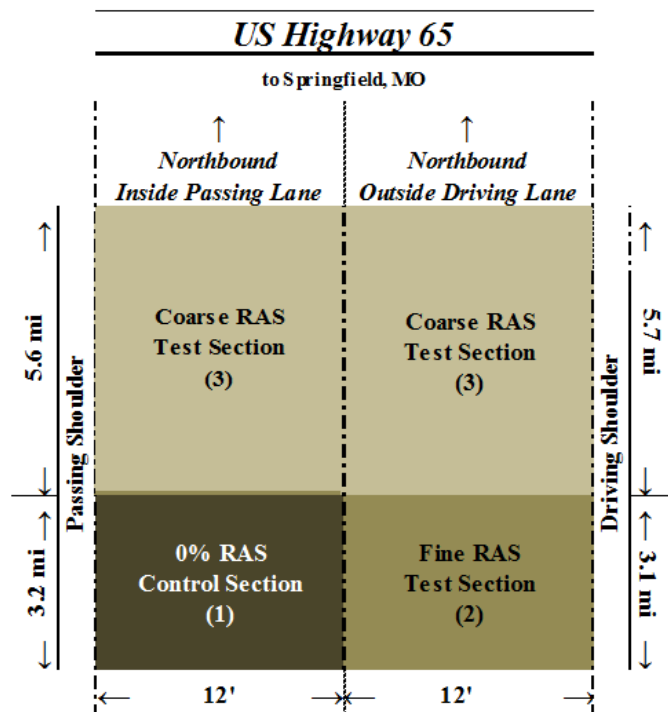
Plan View of Missouri Demonstration Project Test Sections [35]
